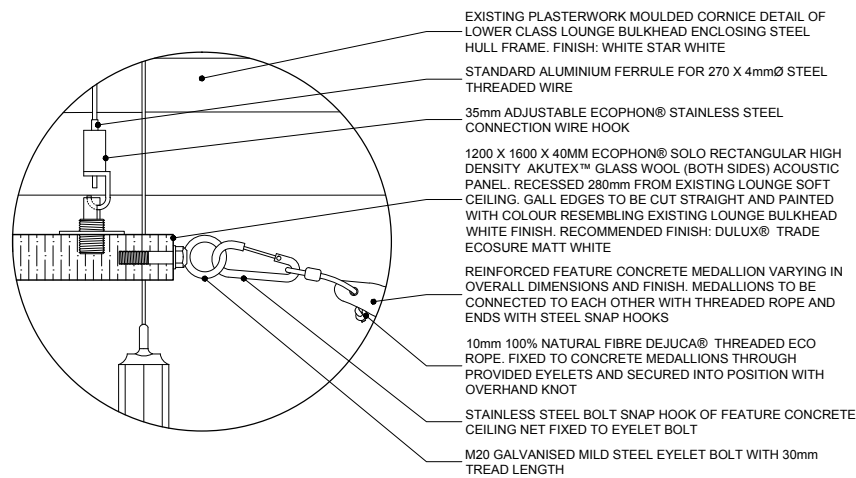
Balustrade Lighting Assembly and Construction Detail (Author, 2016)
